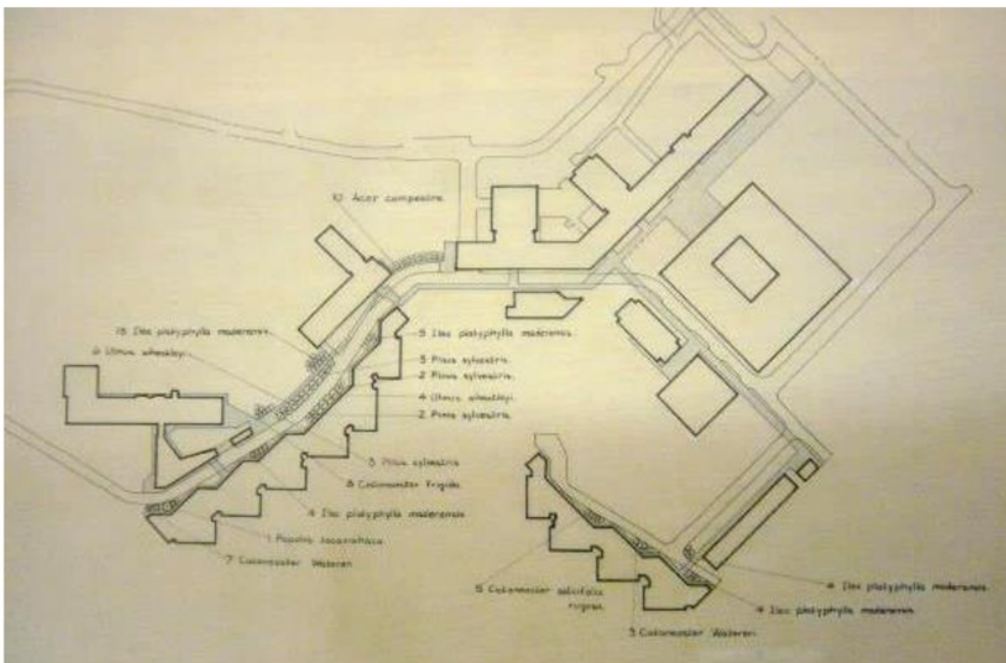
Brenda Colvin, Ornamental plantings along walkways and academic buildings
